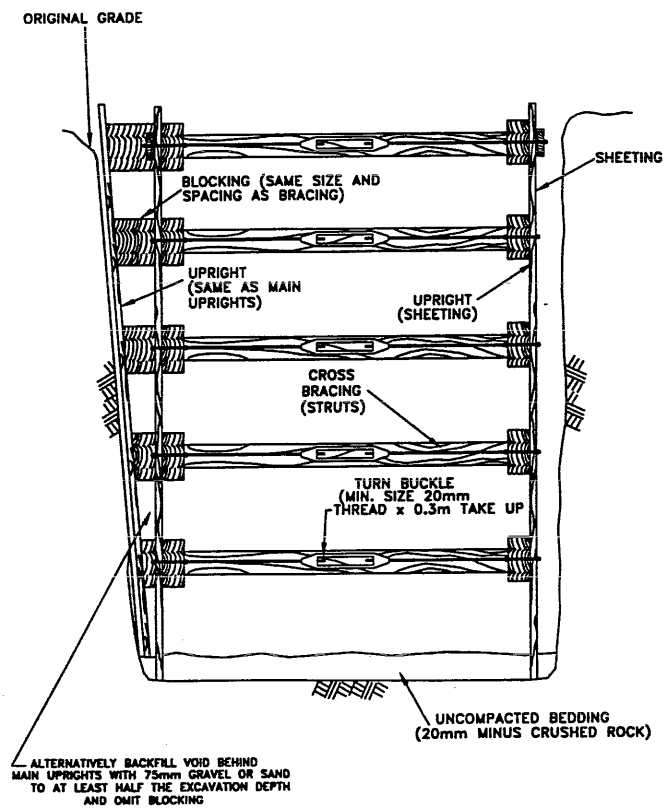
City of Vancouver generic shoring design for sewer trenches
